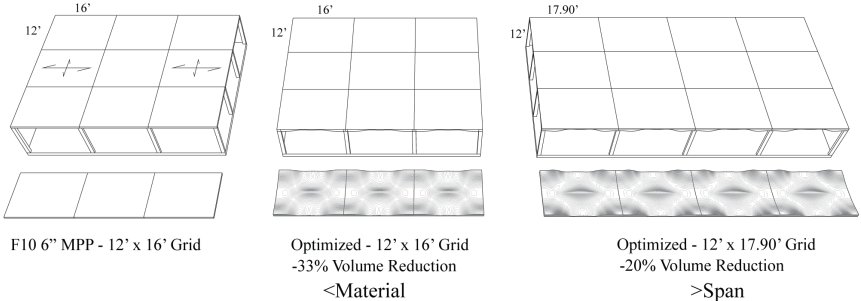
Optimized panel usage in F10 6" MPP typical grid layout for impact of less material or greater span
